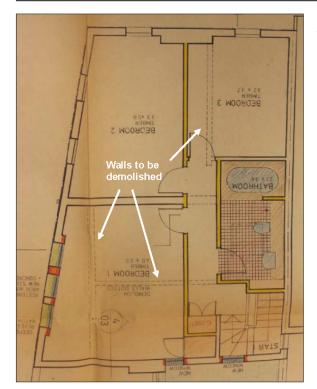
Second floor plan of the main wing. Internal walls were proposed to be removed with new lightweight internal walls, a bathroom and some new windows proposed.
